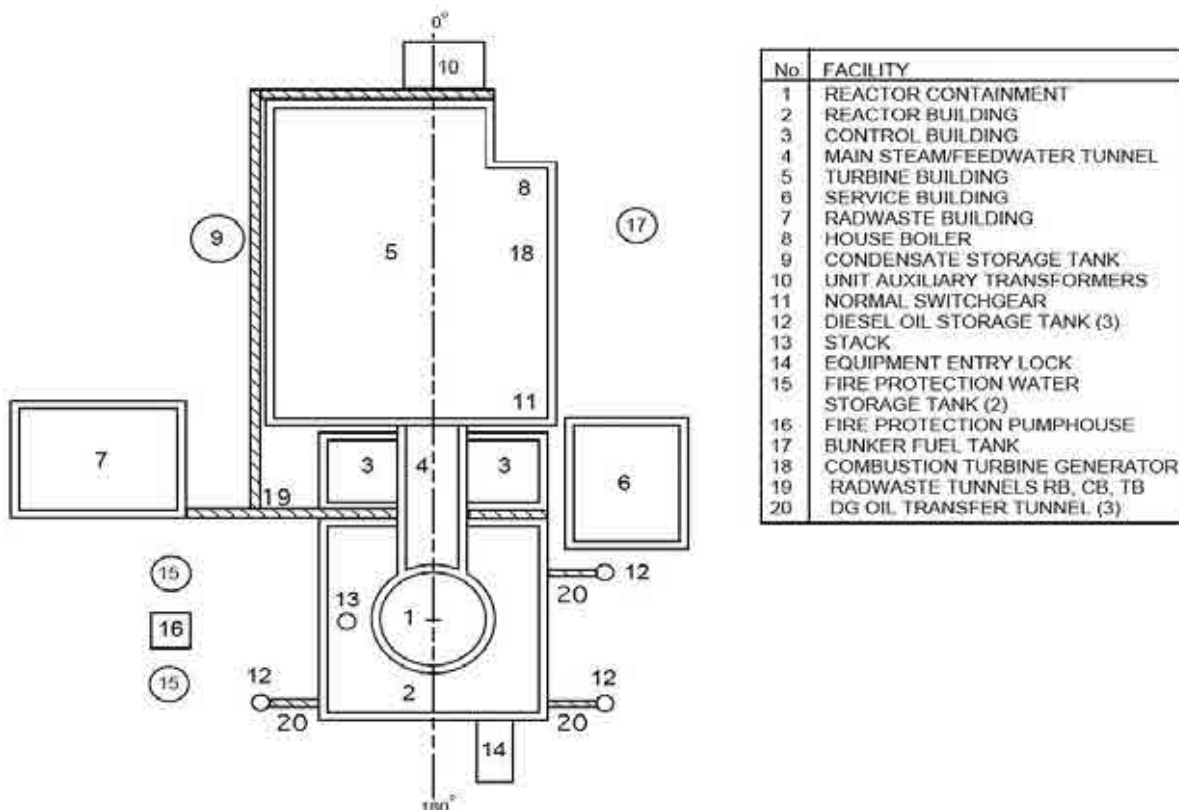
ABWR site plan: CB is control building; TB is turbine building and DG is diesel generator [596].
